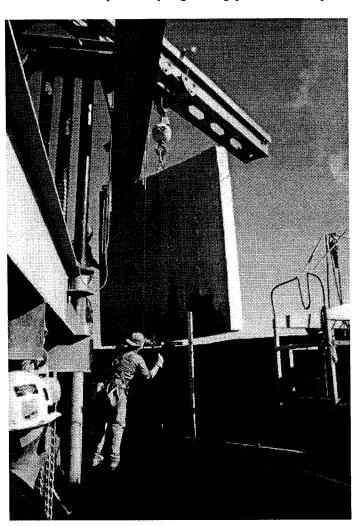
Lifting a Diamond Saw Cut Piece of Chimney
